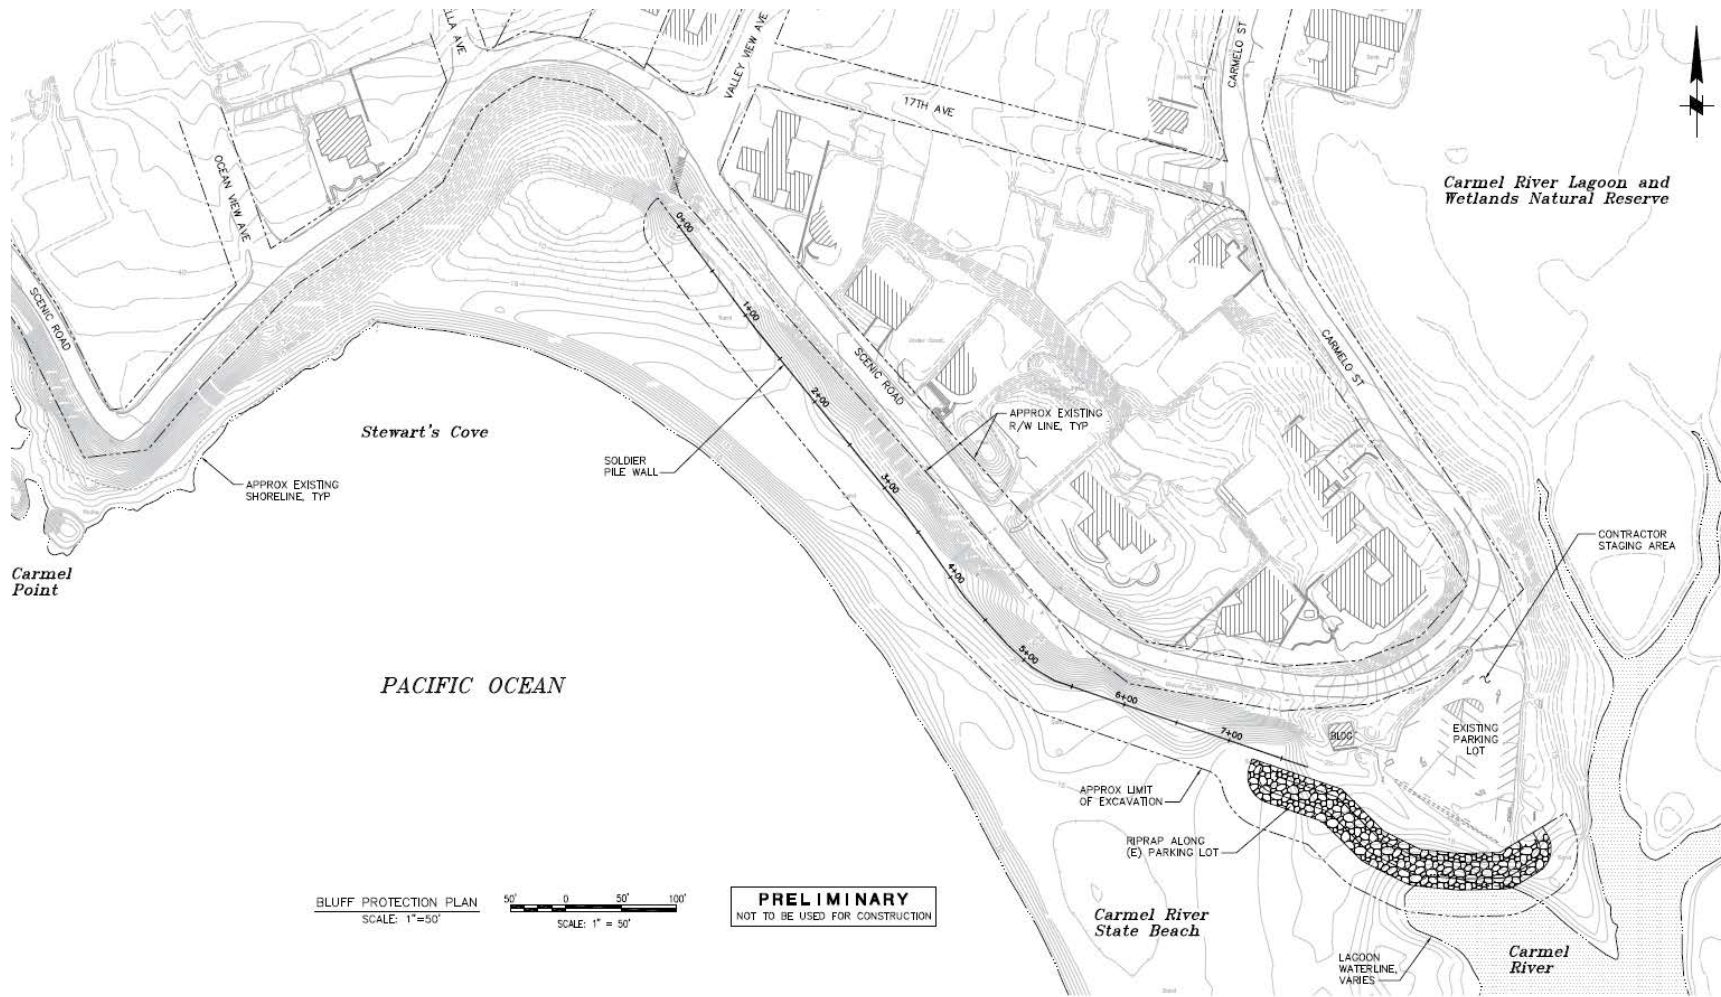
The proposed alignment of the mid-slope toe wall alternative for Scenic Road protection. The rock slope protection element shown surrounding the existing parking lot is optional and dependent on approval from State Parks. The maps depicts the Carmel River against the parking lot and proposed RSP – this is not the current configuration of the river/lagoon which during the dry season is much farther south – see current Google Earth imagery.
